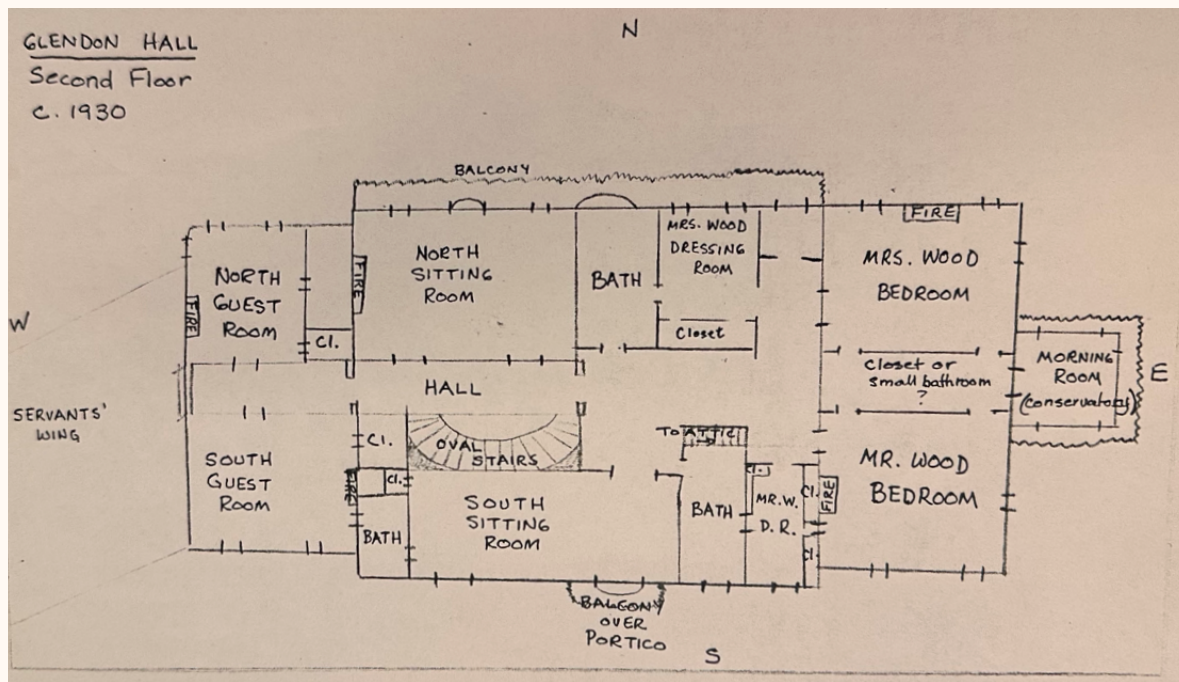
Floor plan showing how the second floor looked like in c. 1930. (Glendon Hall 1920-1950)
